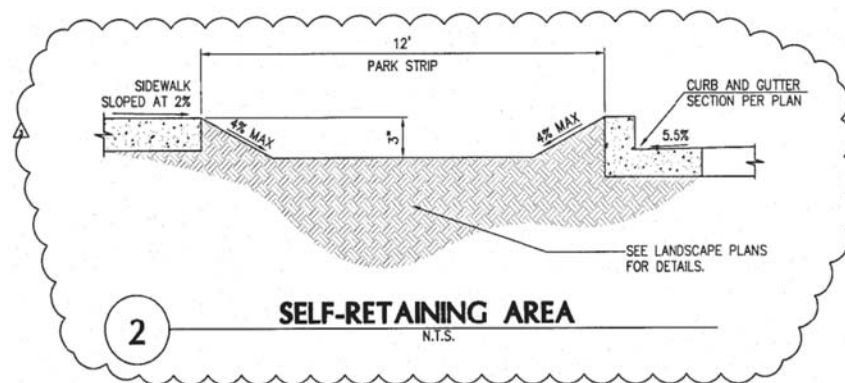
Example Self-Retaining Landscaped Area Cross Section
